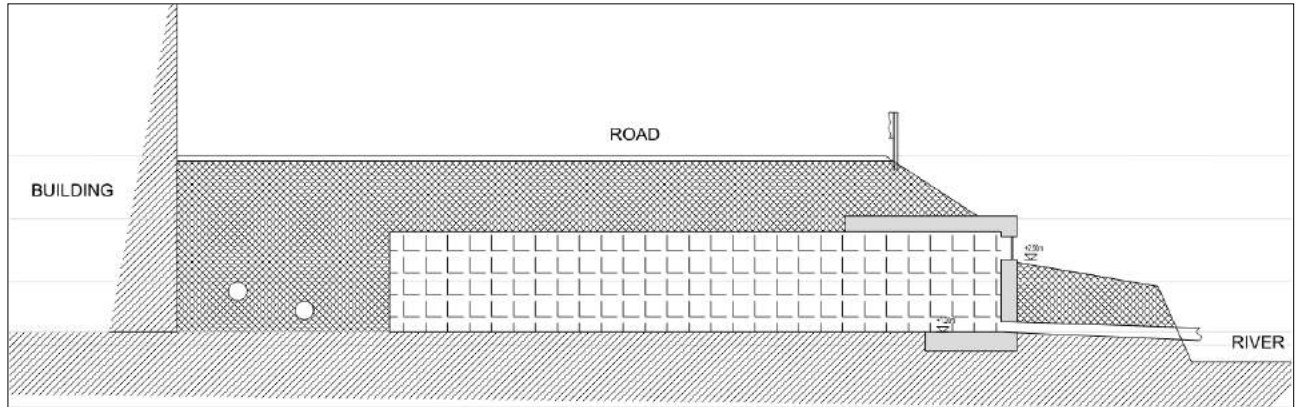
Cross section of the flood compensation storage under the proposed road, showing weir inlet, crates and outlet to river
